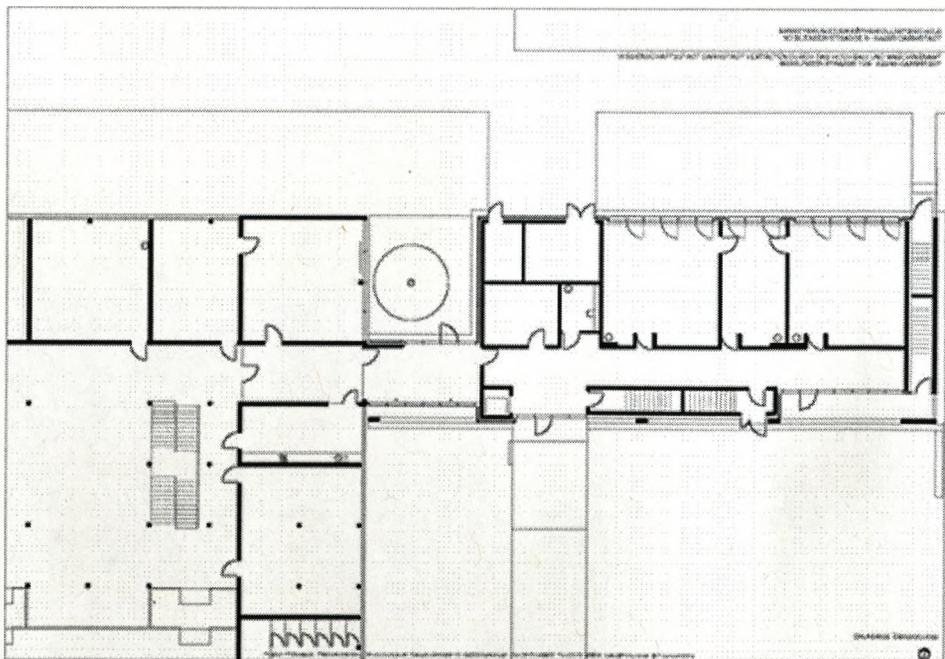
Darmstadt. Ground floor plan of extension (right) and part of the existing building (not to scale).
